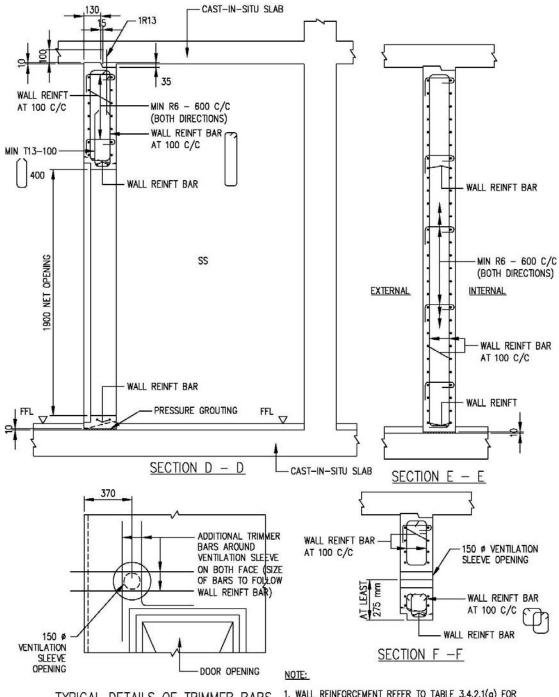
(i) DETAILS AND SECTIONS OF PRECAST SS DOOR FRAME PANEL WITH VENTILATION SLEEVE ALONG ITS SIDE (TYPE 2)
